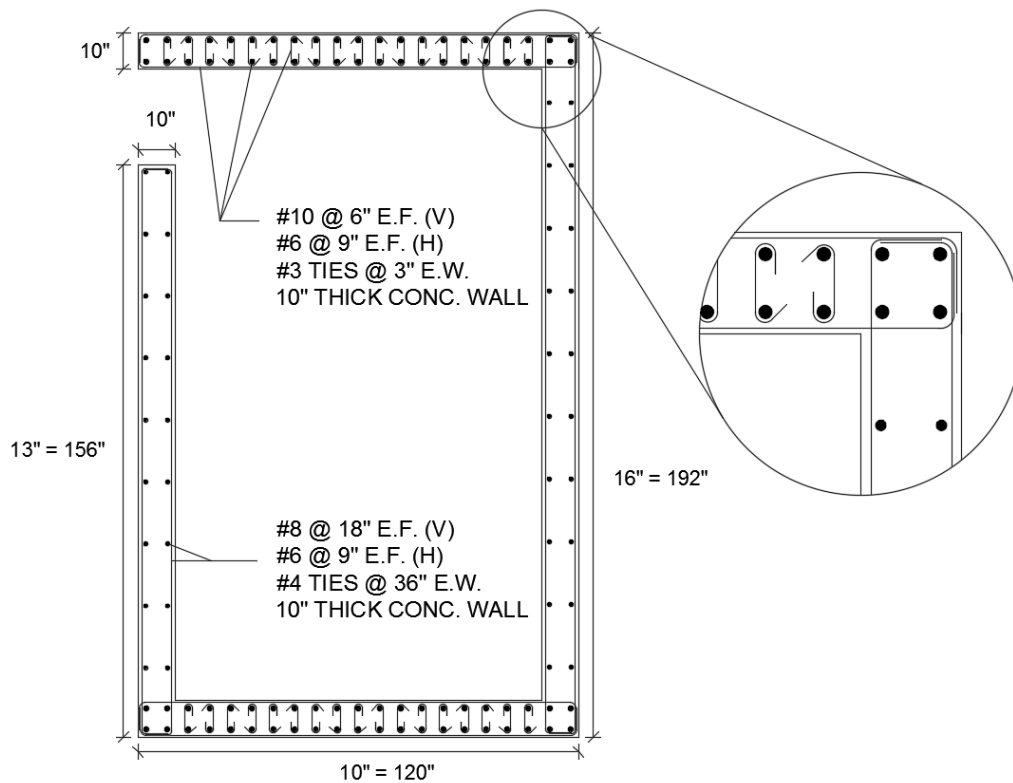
New stairwell shear wall cross-section at the ground floor level
